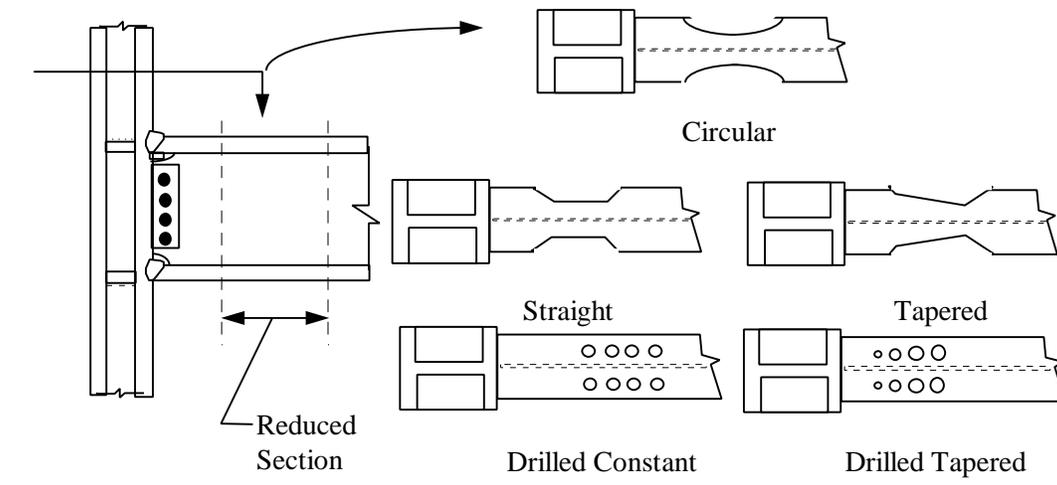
Alternative Reduced-Beam Section Patterns
